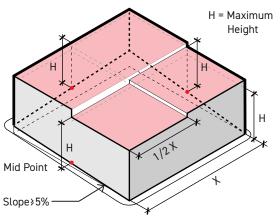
BUILDING HEIGHT ON SLOPE
